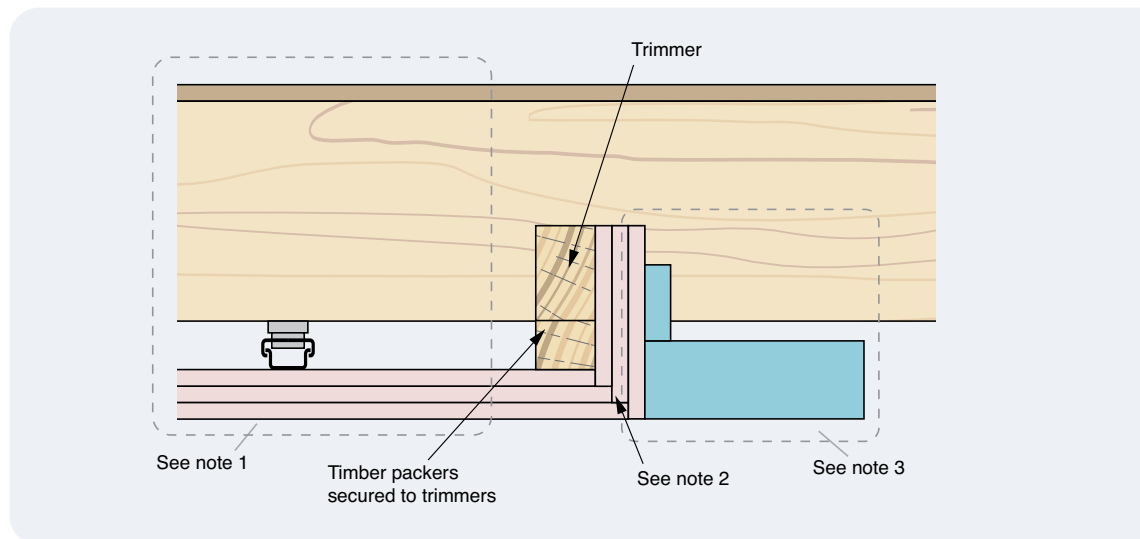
Access panel in a fire-protected floor/ceiling system.
